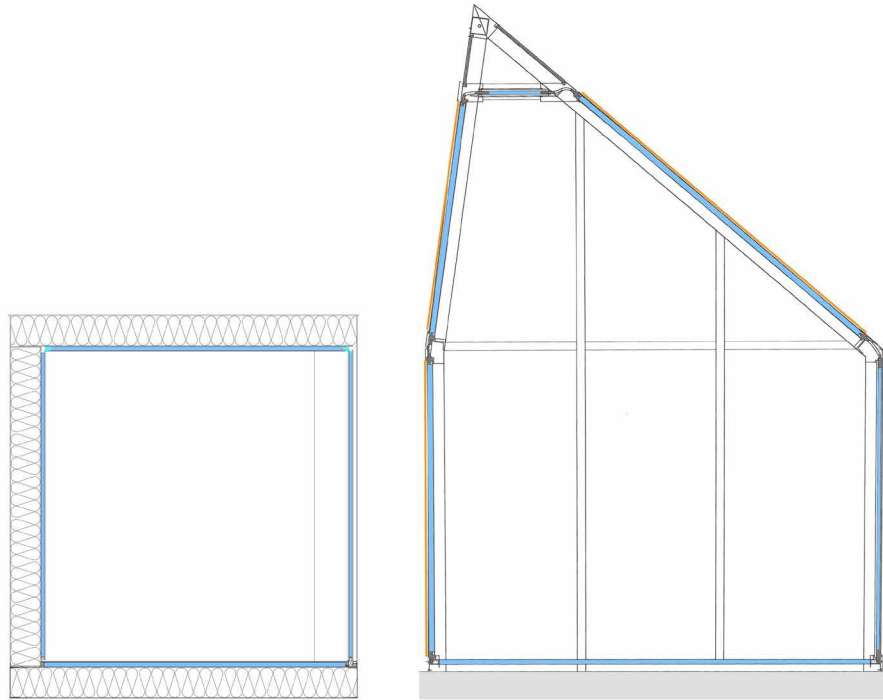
Sections of Water House 1.0 (left) and Water House 2.0 (right) showing SIP and frame + infill structures, respectively. Opaque (steel) panels are highlighted with orange lines.
